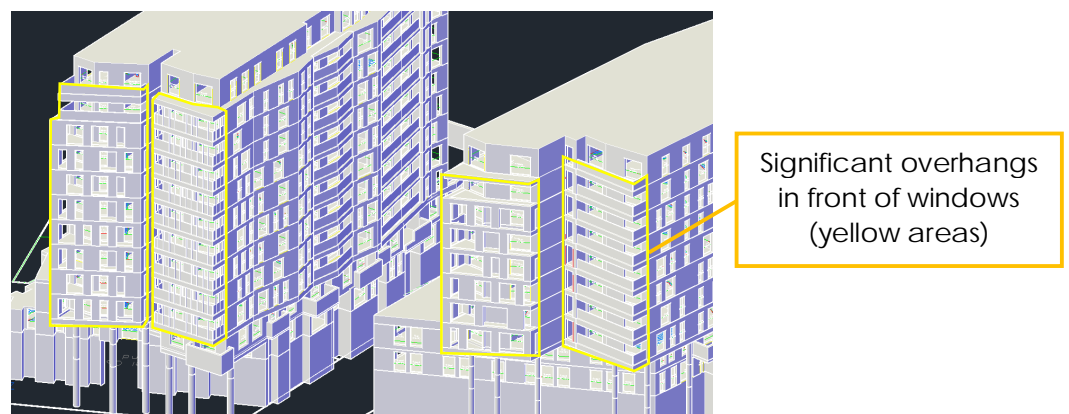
the northern elevations of Ossel Court & Distel Apartments (ground not shown)
